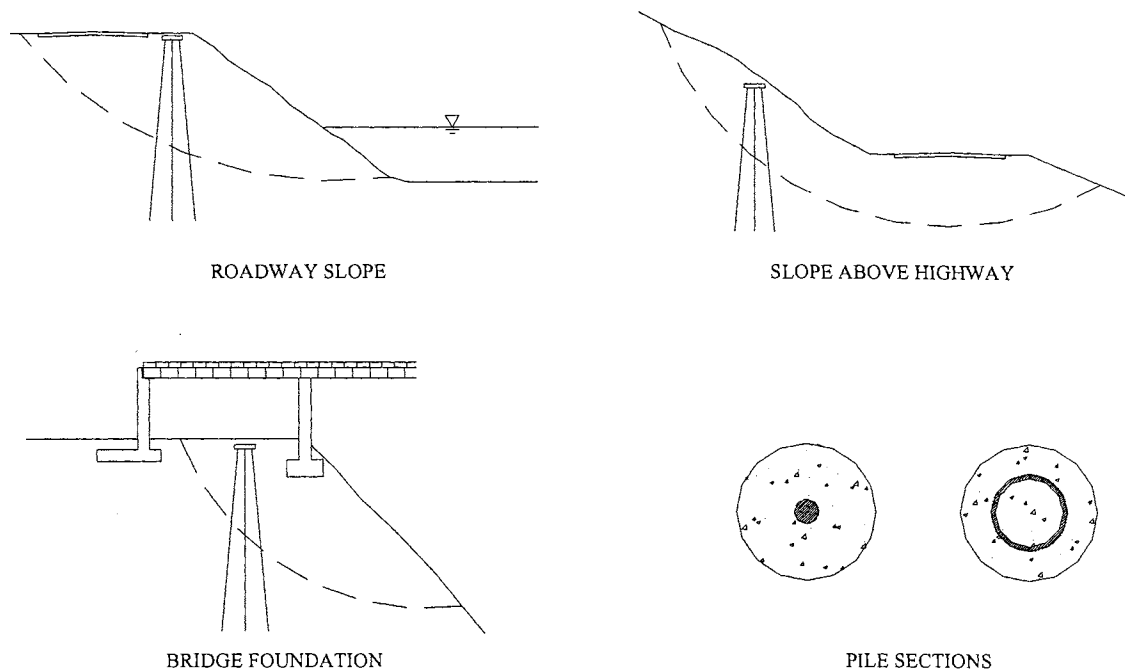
Typical Configurations and Applications for Type “A” INSERT Walls
